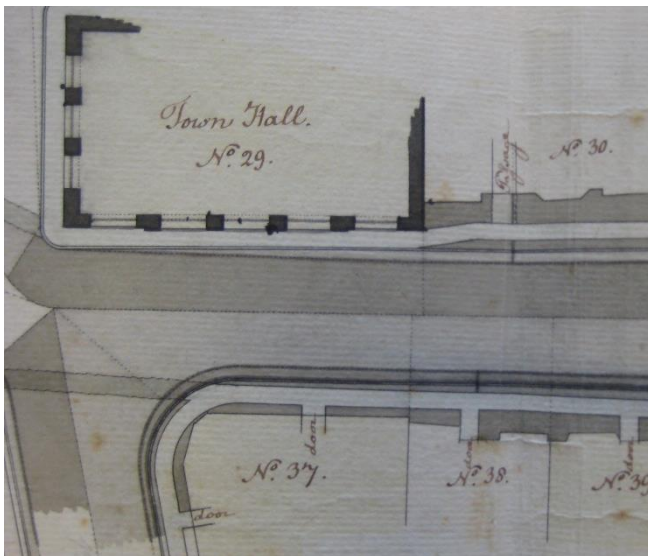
street plan of Chapel St, c. 1785. North is to the left
